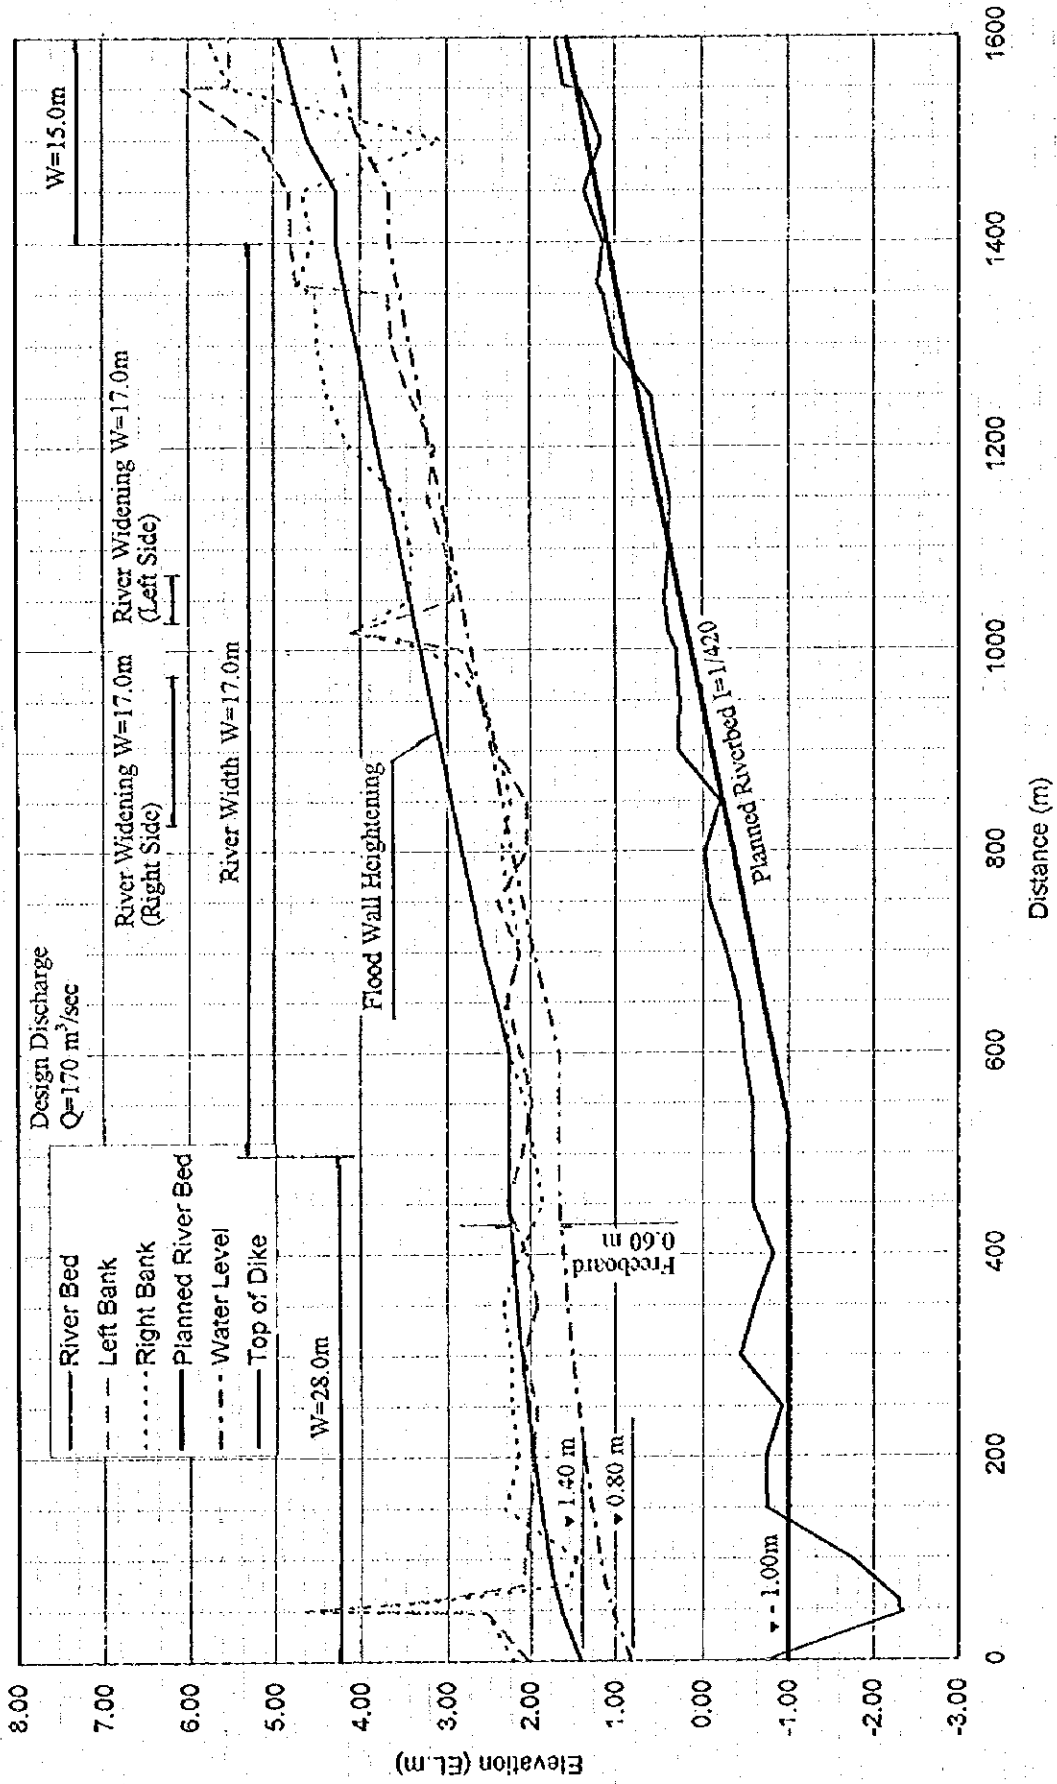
Longitudinal Section of Ruhu River Improvement Plan
